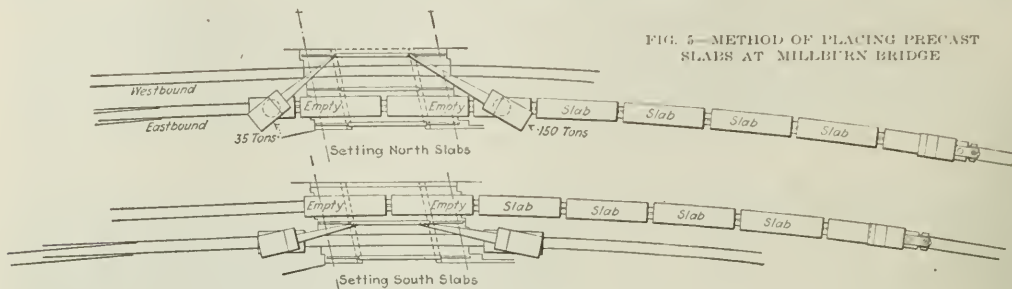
METHOD OF PLACING PRECAST SLABS AT MILLBURN BRIDGE
